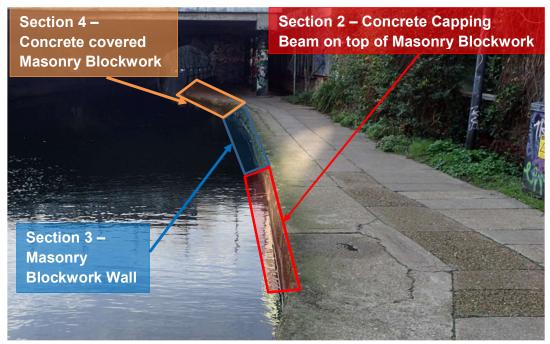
Photograph indicating Wall Section 2, 3 & 4
